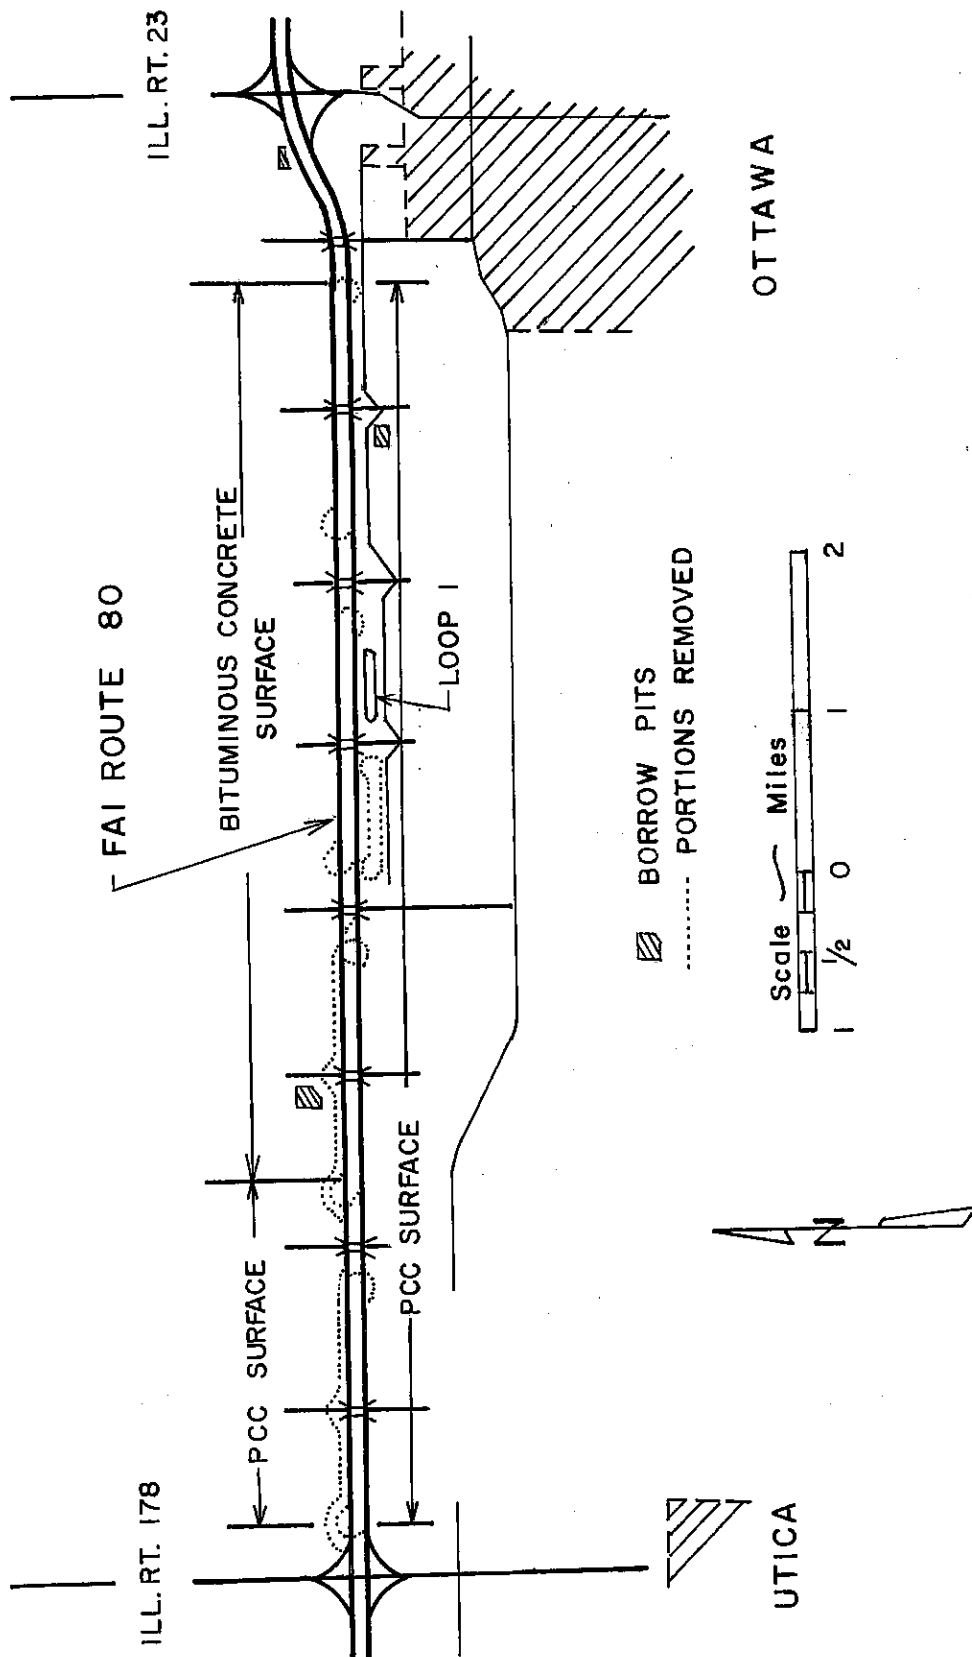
Layout of the Rehabilitated AASHO Test Road.
